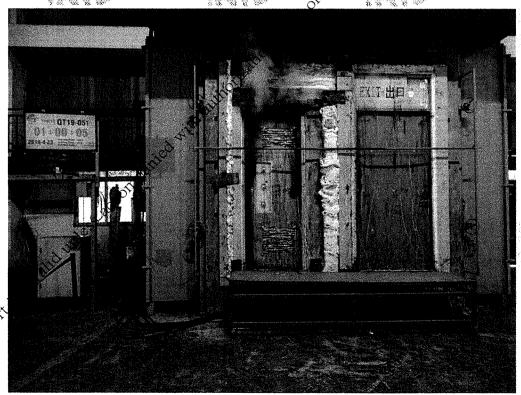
Unexposed surface of the specimens at 60 minutes of test.
